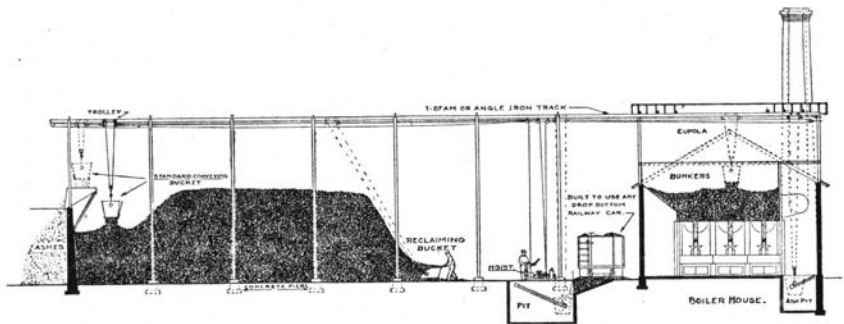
GODFREY CONVEYOR SYSTEM FOR STORING AND HANDLING COAL
